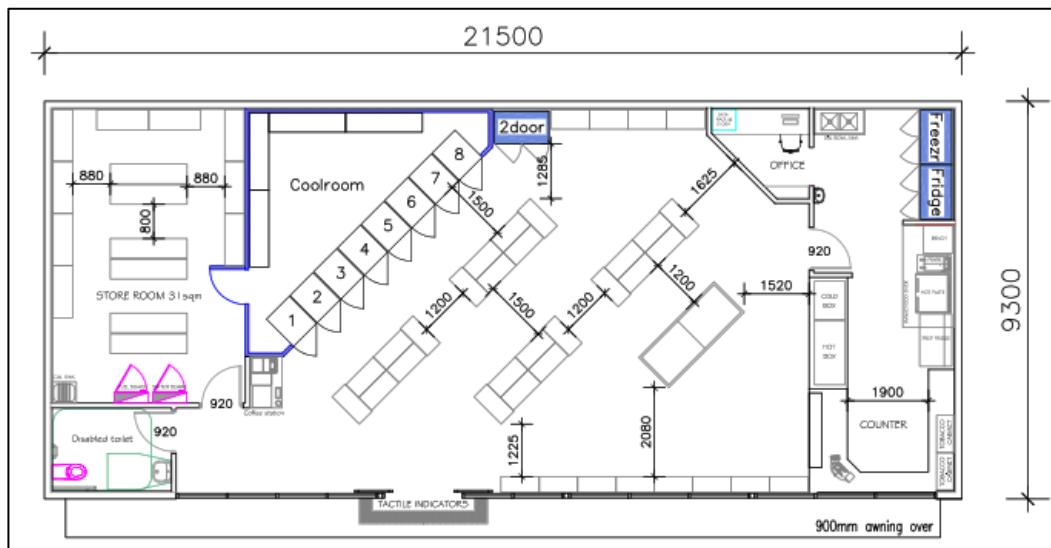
Extract of sales building floor plan (Source: Badaououi Group, 2025)
